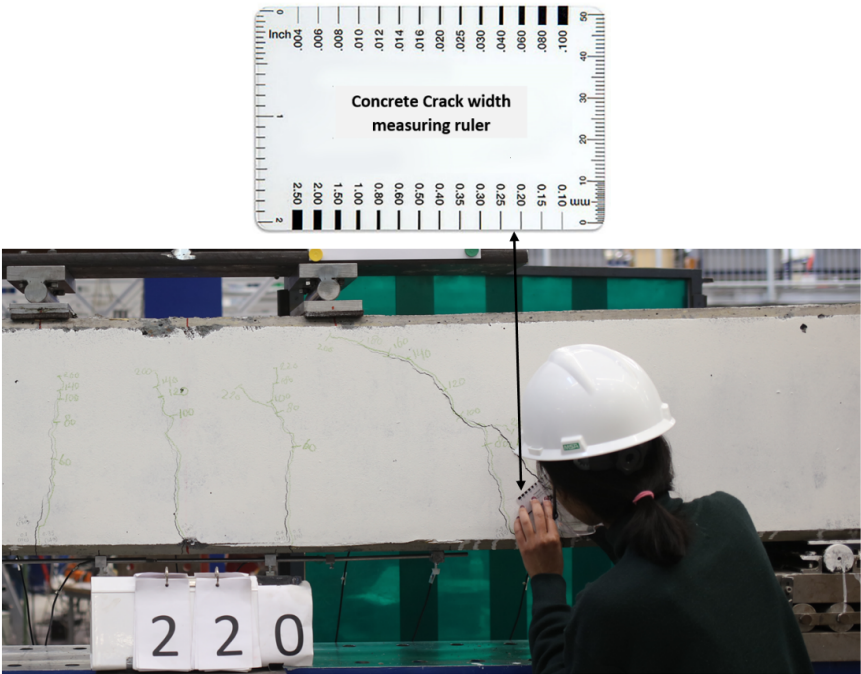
Measurement of cracks using concrete crack width ruler
